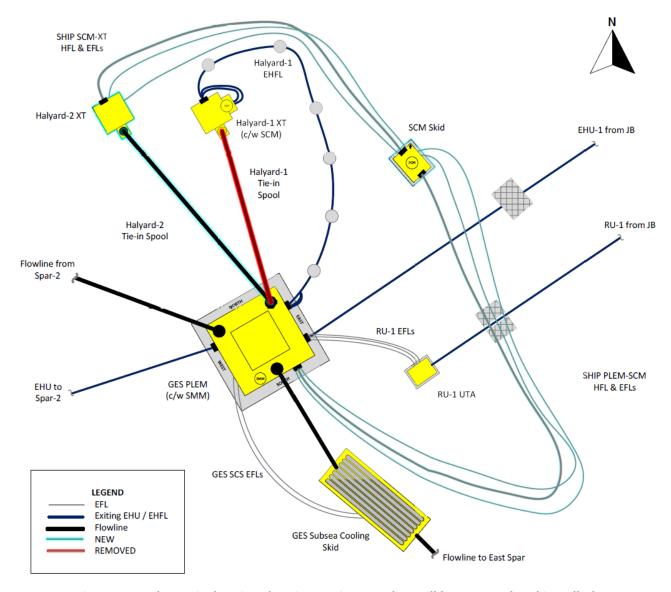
Schematic drawing showing equipment that will be removed and installed
